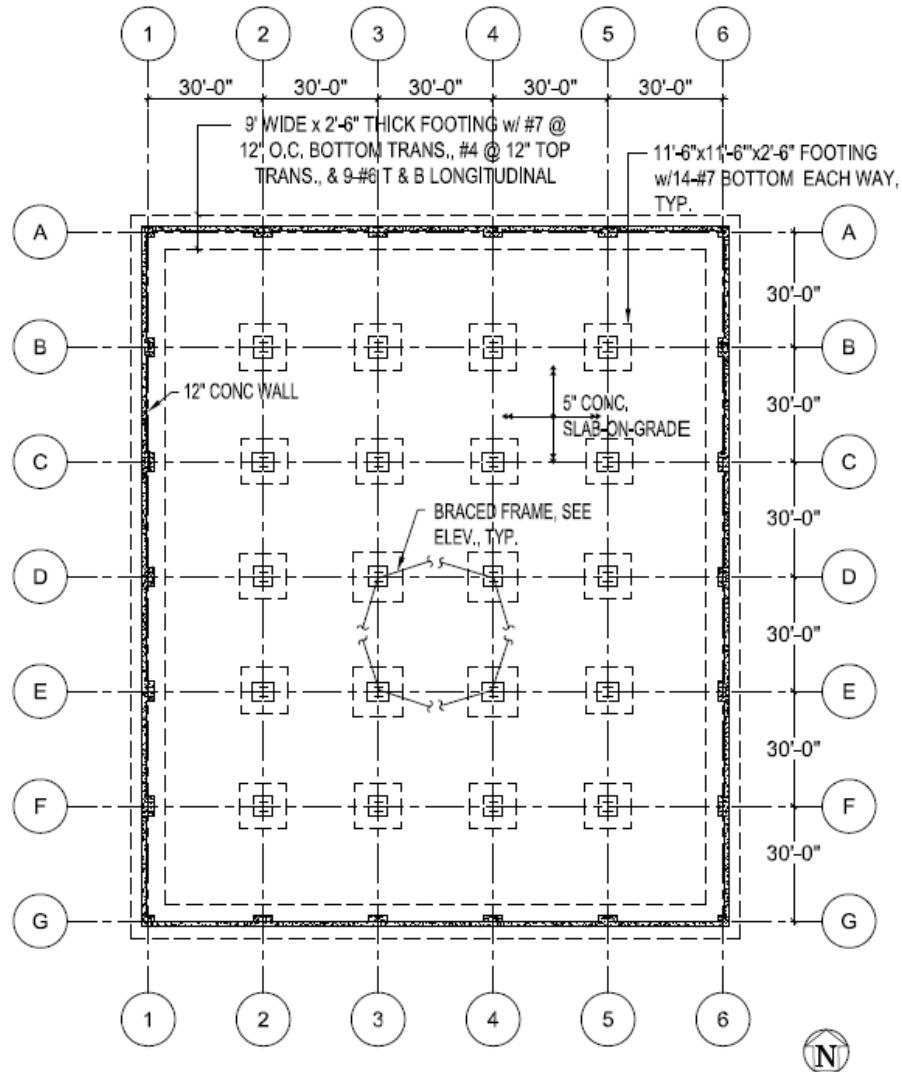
Hospital building foundation plan showing brace layout for wind design.
